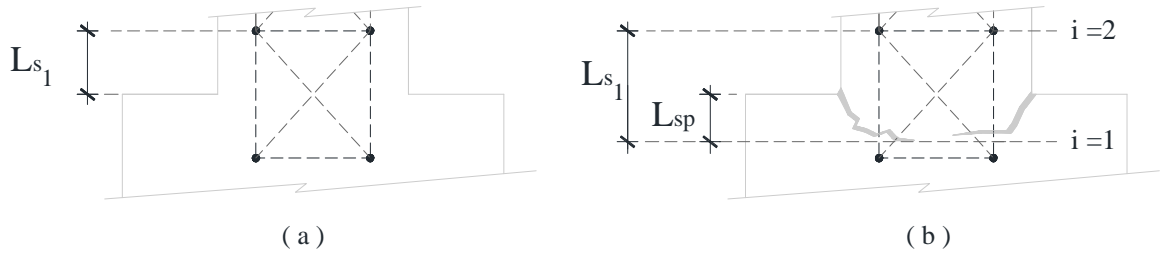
Definition of the length of the sub-element at the base: a) before considerable flexural cracking in the foundation, b) after considerable flexural cracking in the foundation.
